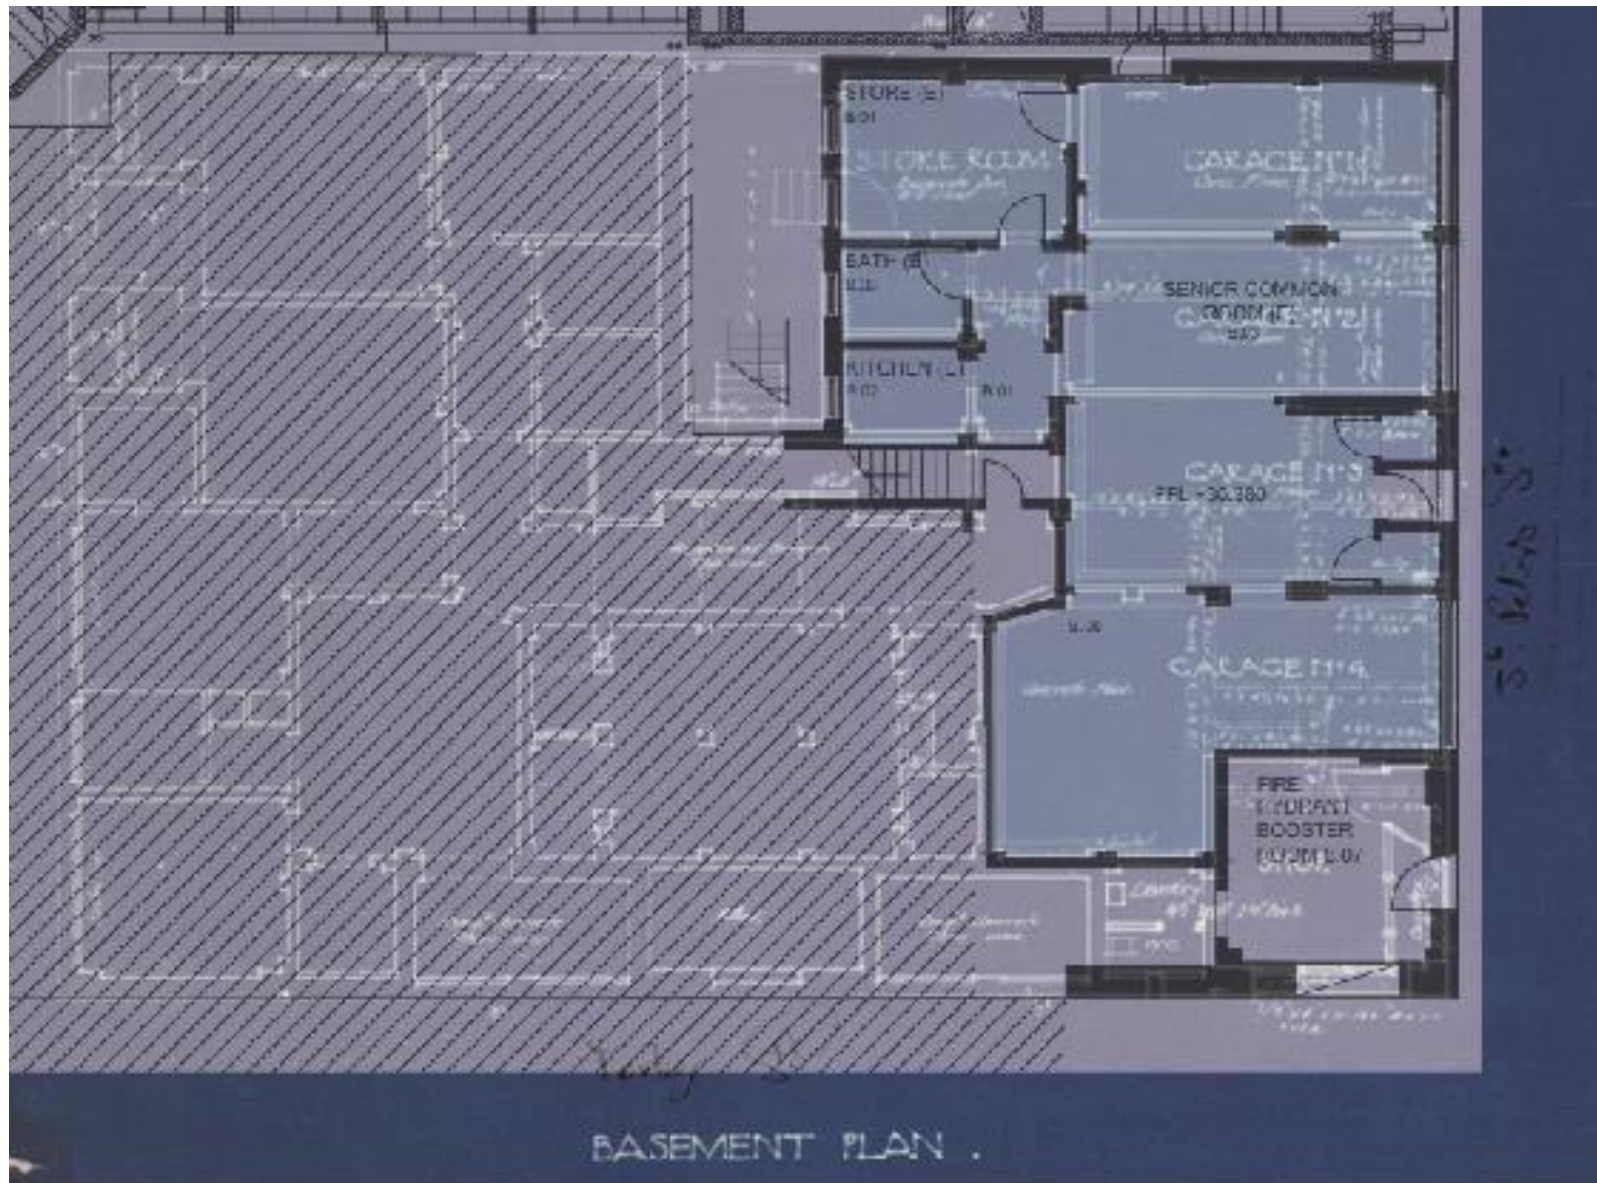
Overlay of current basement plans (top) over original basement plans (base layer), showing removed walls and modification to floorplan.
